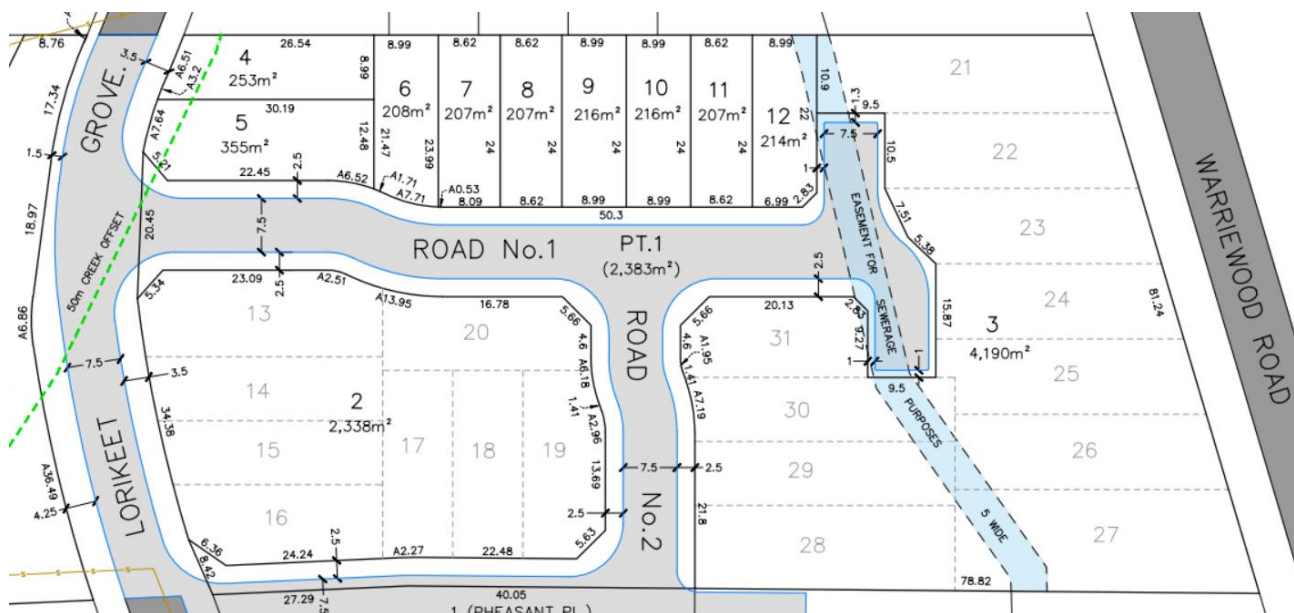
Location of sewer easement highlighted shaded in blue upon the subdivision plan.
